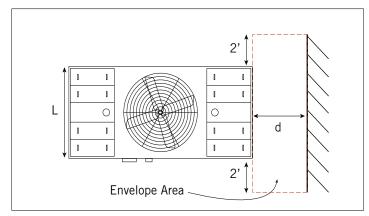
Plan View of a Dual Air Intake Unit Adjacent to Wall
